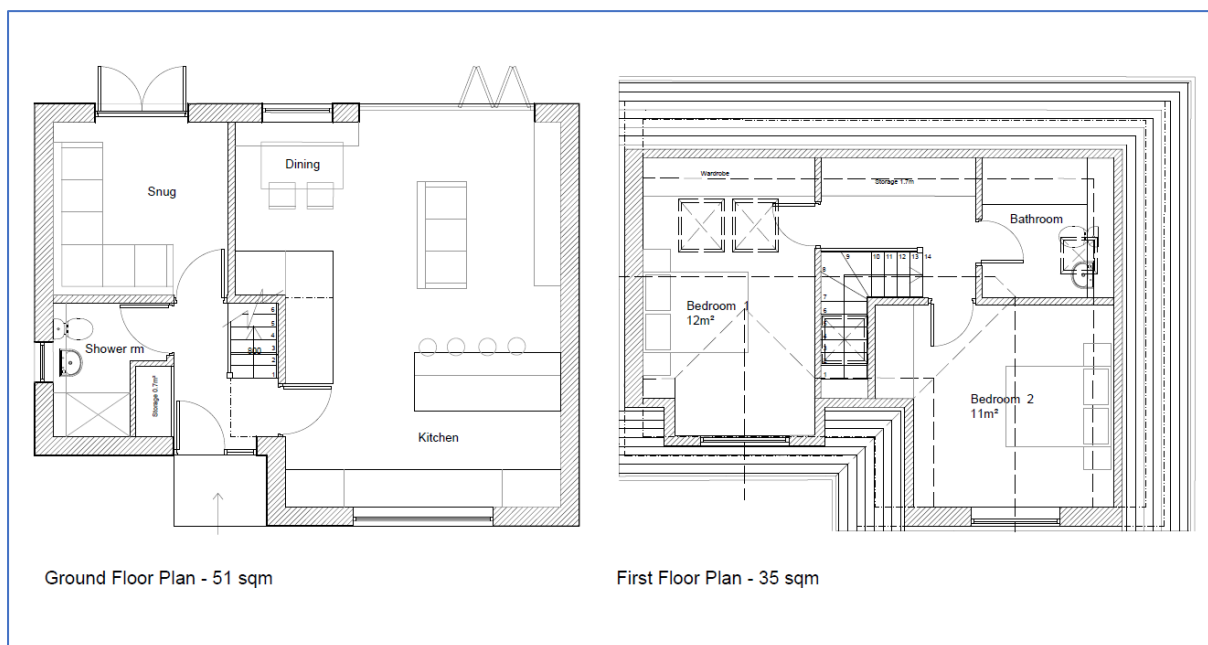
Proposed Ground Floor Layout Plan (Source: Paula Philp Architecture)
